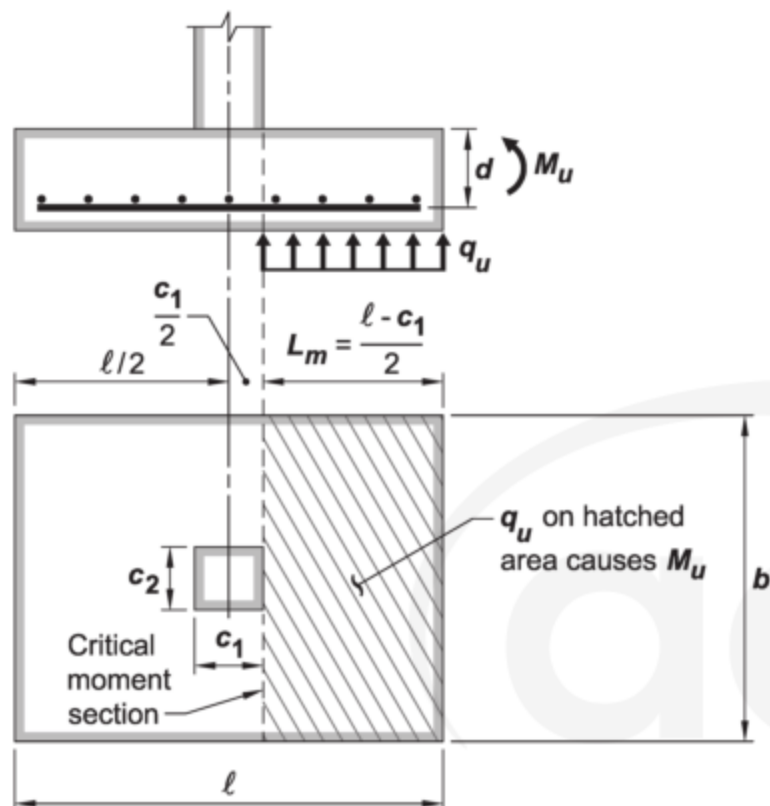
Moment critical section in footing at reinforced concrete column face.
